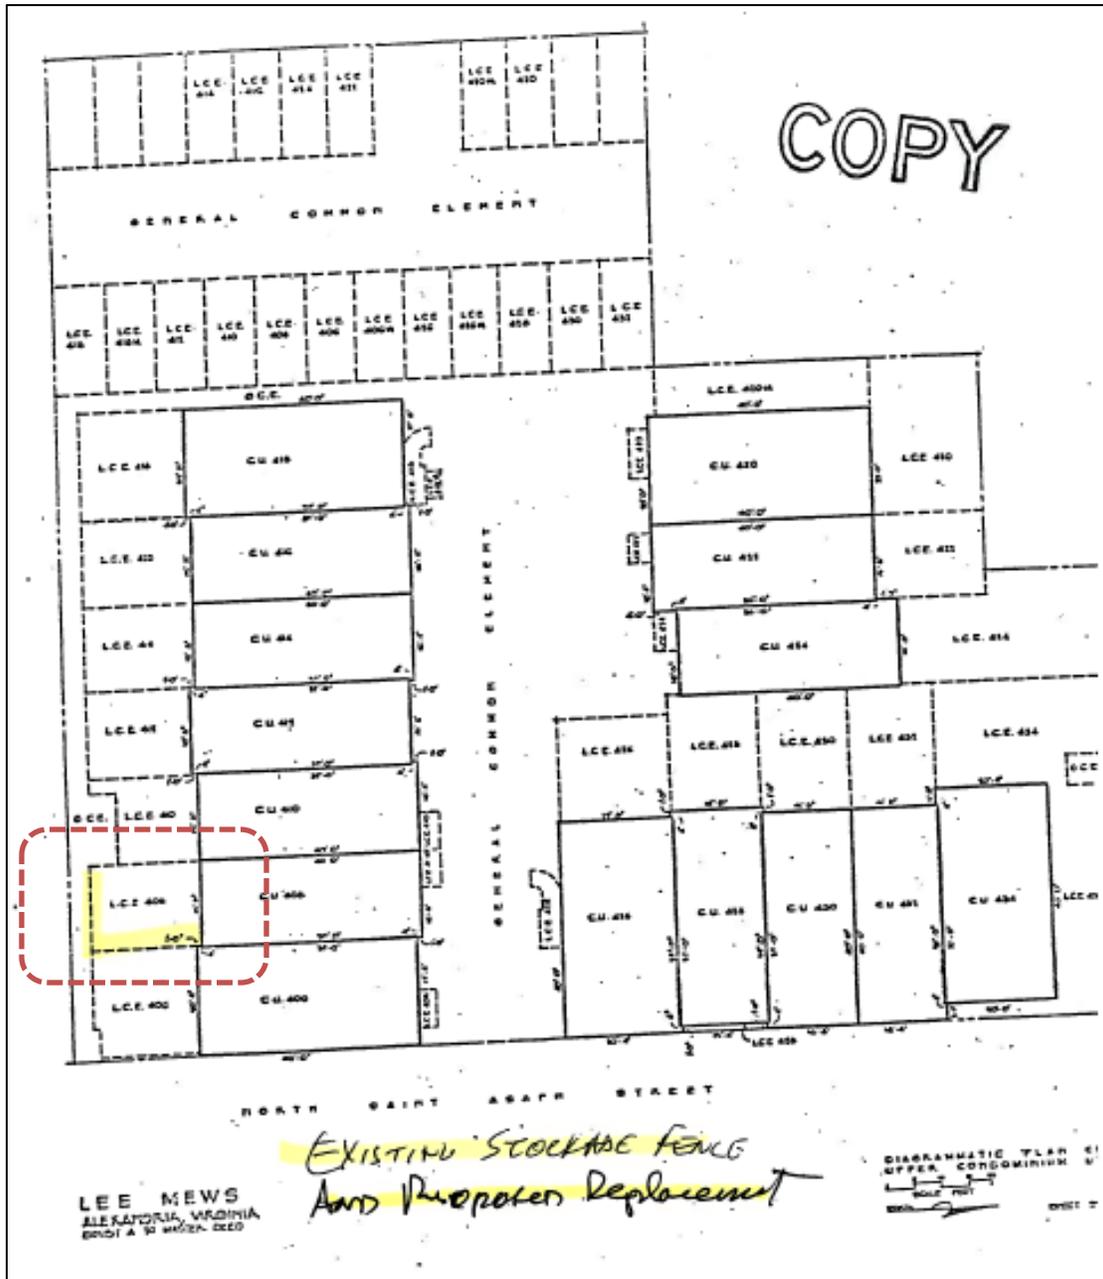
Site Plan showing placement of existing fence/replacement wall.
